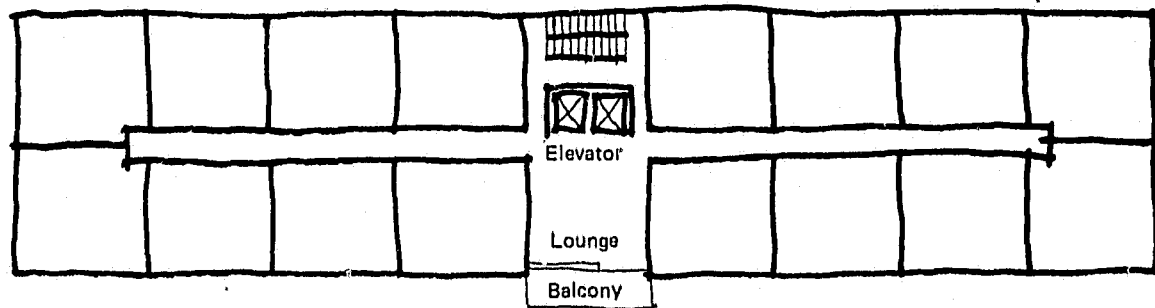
Typical floor of high-rise for the elderly, showing location of a lounge area adjacent to the elevators.
